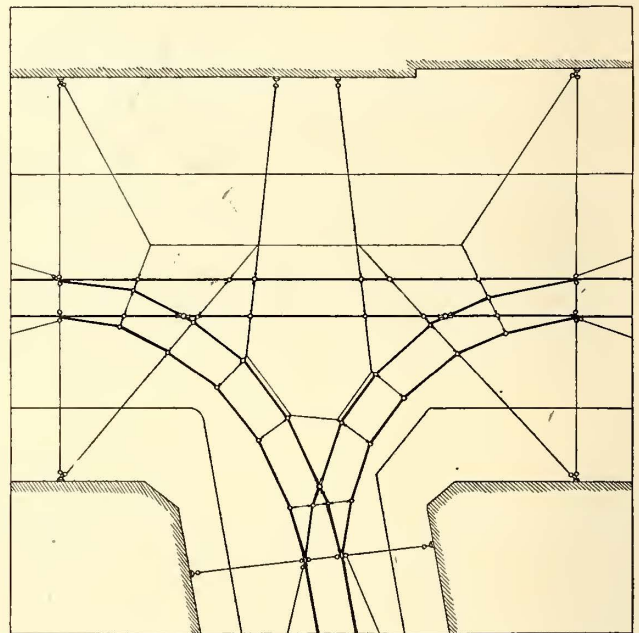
OVERHEAD WIRING FOR TROLLEY WHEEL, BERLIN
